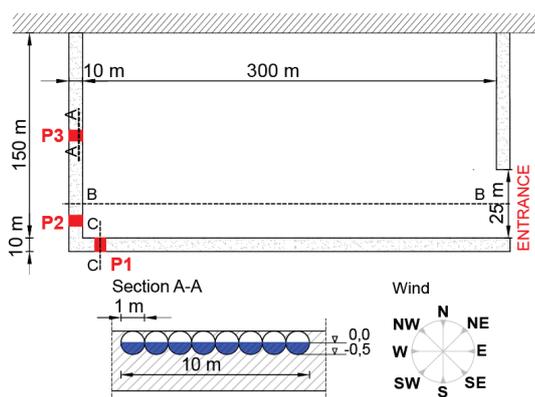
The hypothetical marina scheme with basic geometric features (A-A cross-section through the culverts; B-B vertical cross-section through the centre of the entrance; C-C vertical cross-section through the breakwater; culverts positions: position 1 - P1, position 2 - P2, position 3 - P3)
